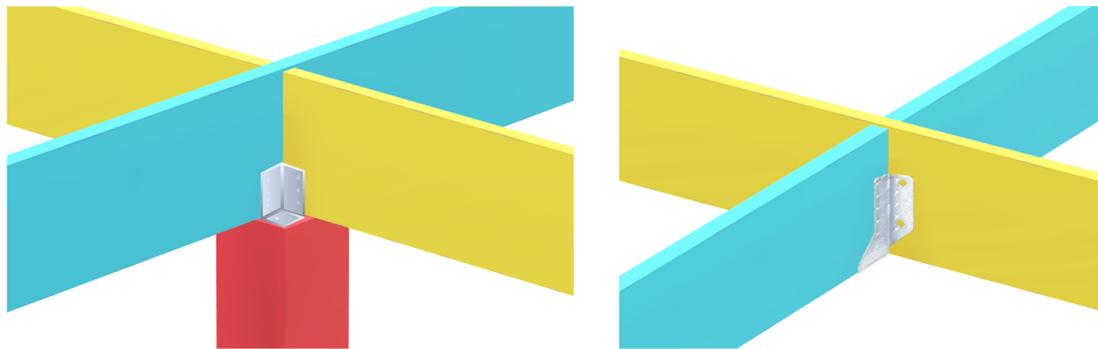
Detailing of the hinged top connections in timber baseline designs
